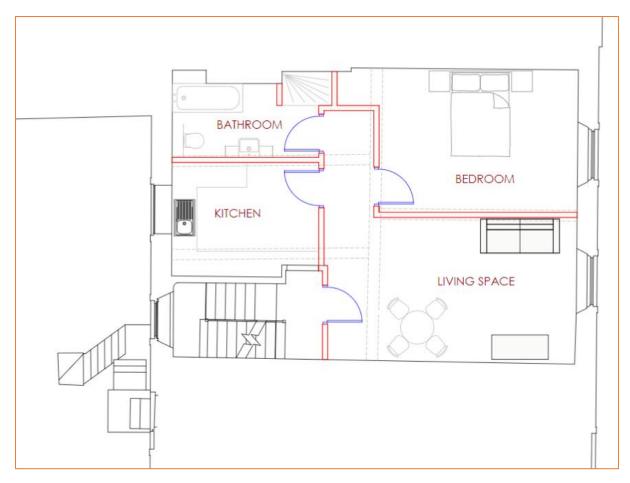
Proposed first floor plans for the development (Source: hdp associates)
